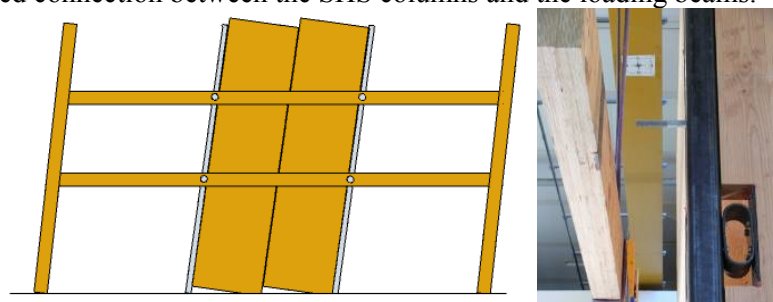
a) Representation of the behaviour of the loading beams for the High Seismic option, as uplift occurs in the walls, b) pin connection between SHS and loading beams, during construction.
